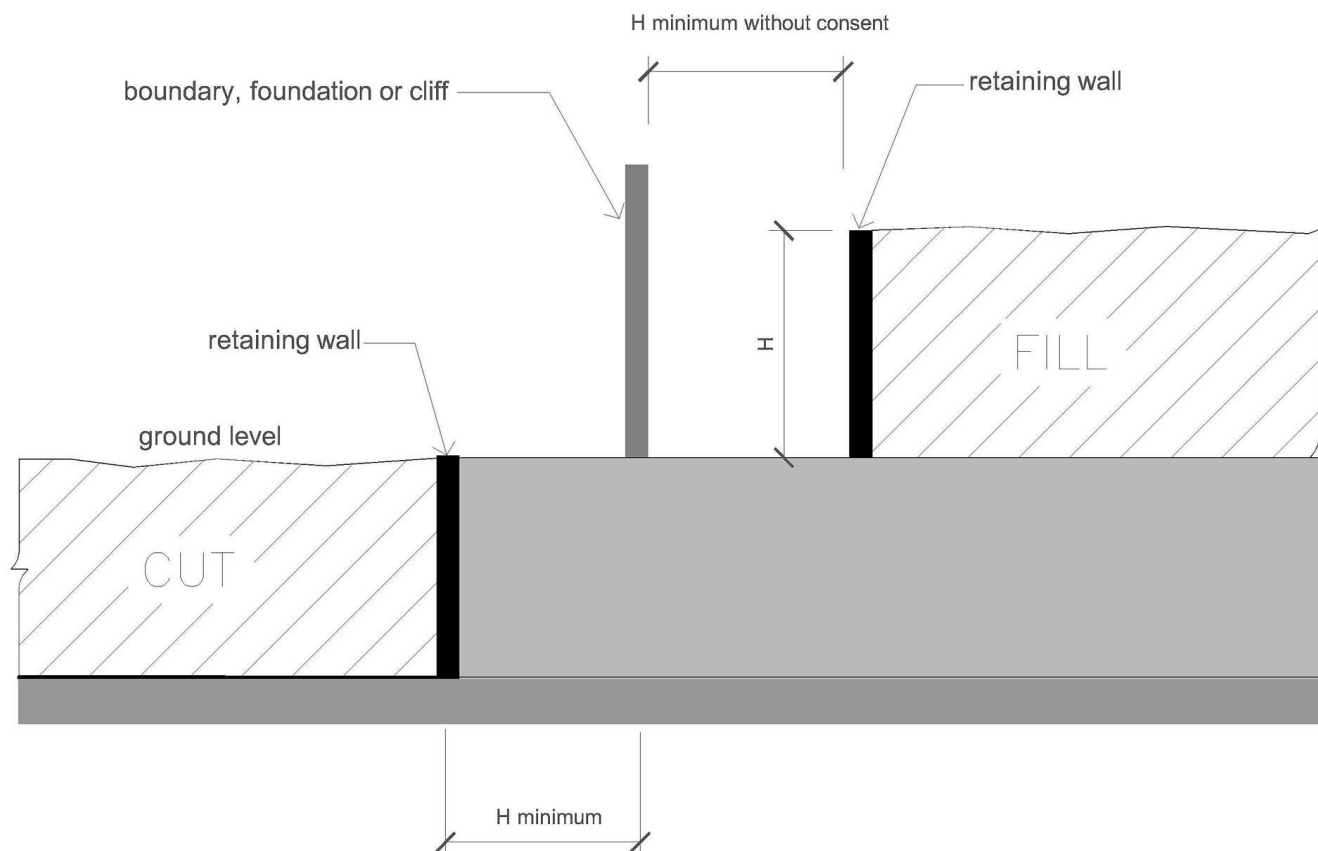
B Cut and fill supported by retaining walls (elevation view)
